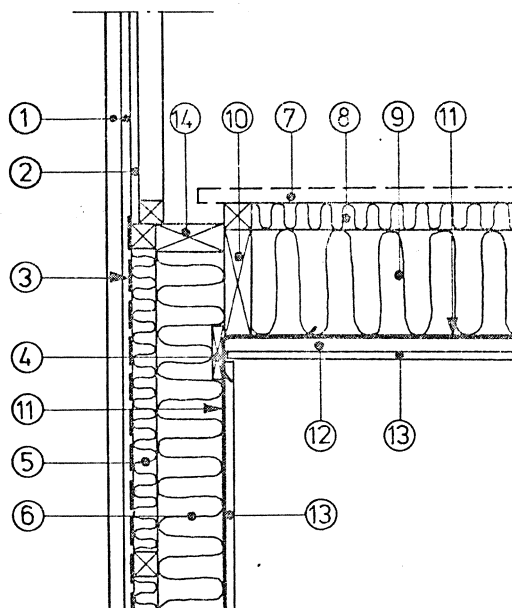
Vertical section through junction of the attic ceiling and the gable wall
